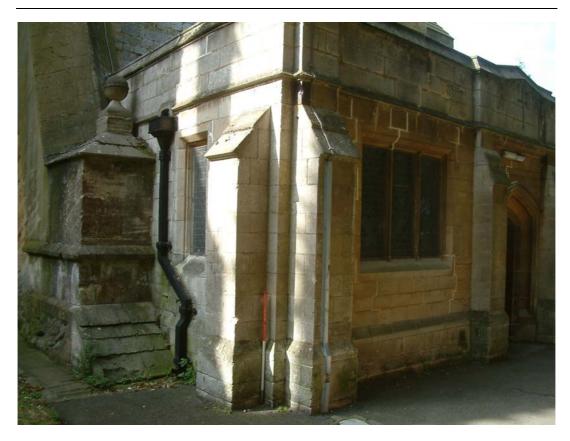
North-east corner of vestry prior to excavation, facing south-west
